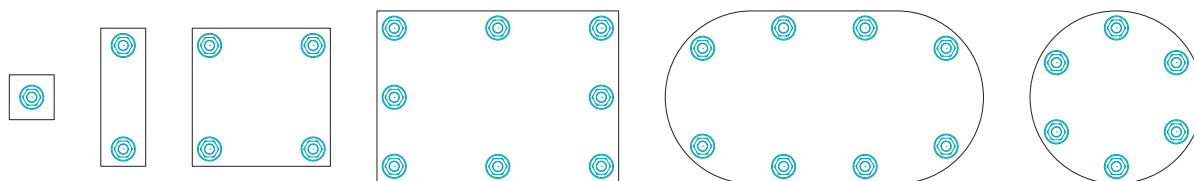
Examples with layout patterns of HPM® Rebar Anchor Bolts.
